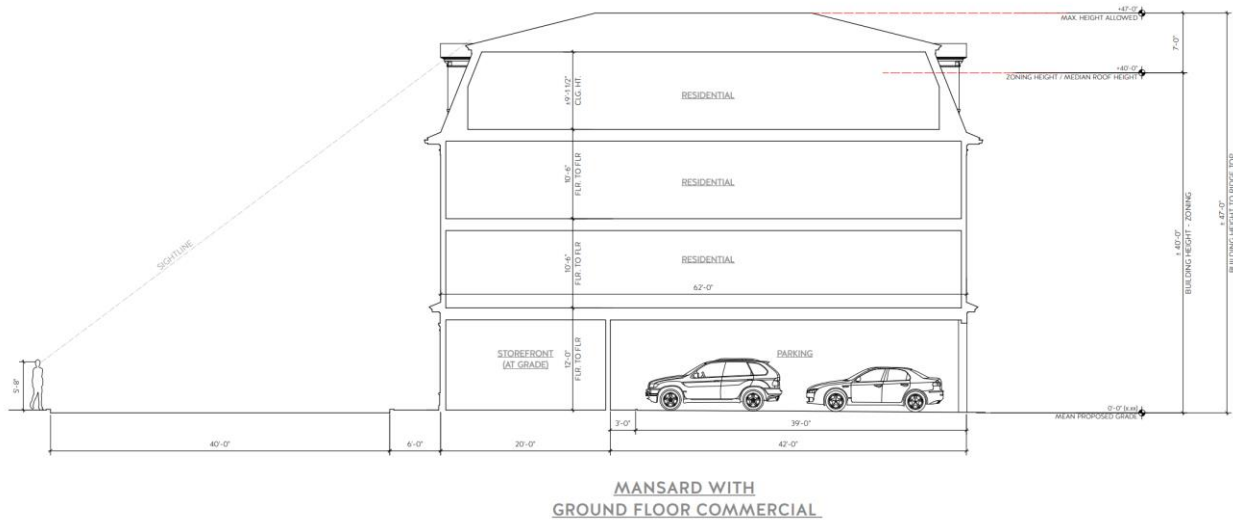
Proposed 40’ Building Height for the Mixed-Use Hanover Street Building
